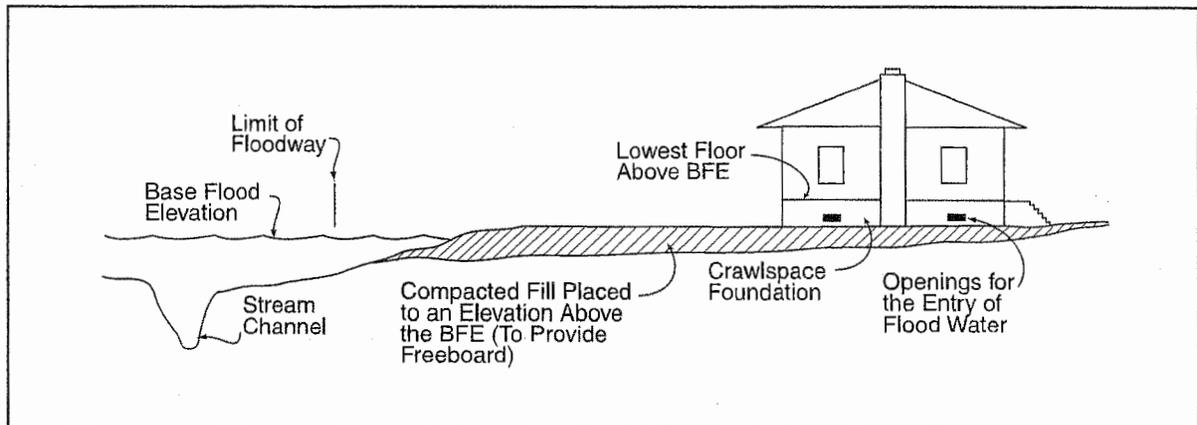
Structure on a crawlspace foundation. The lowest floor is raised above the BFE. Openings in the foundation walls allow water from floods higher than the fill elevation to enter the crawlspace and equalize the pressure on foundation walls.
